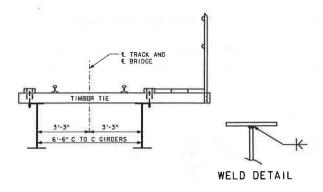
Section through open deck bridge and weld detail.
